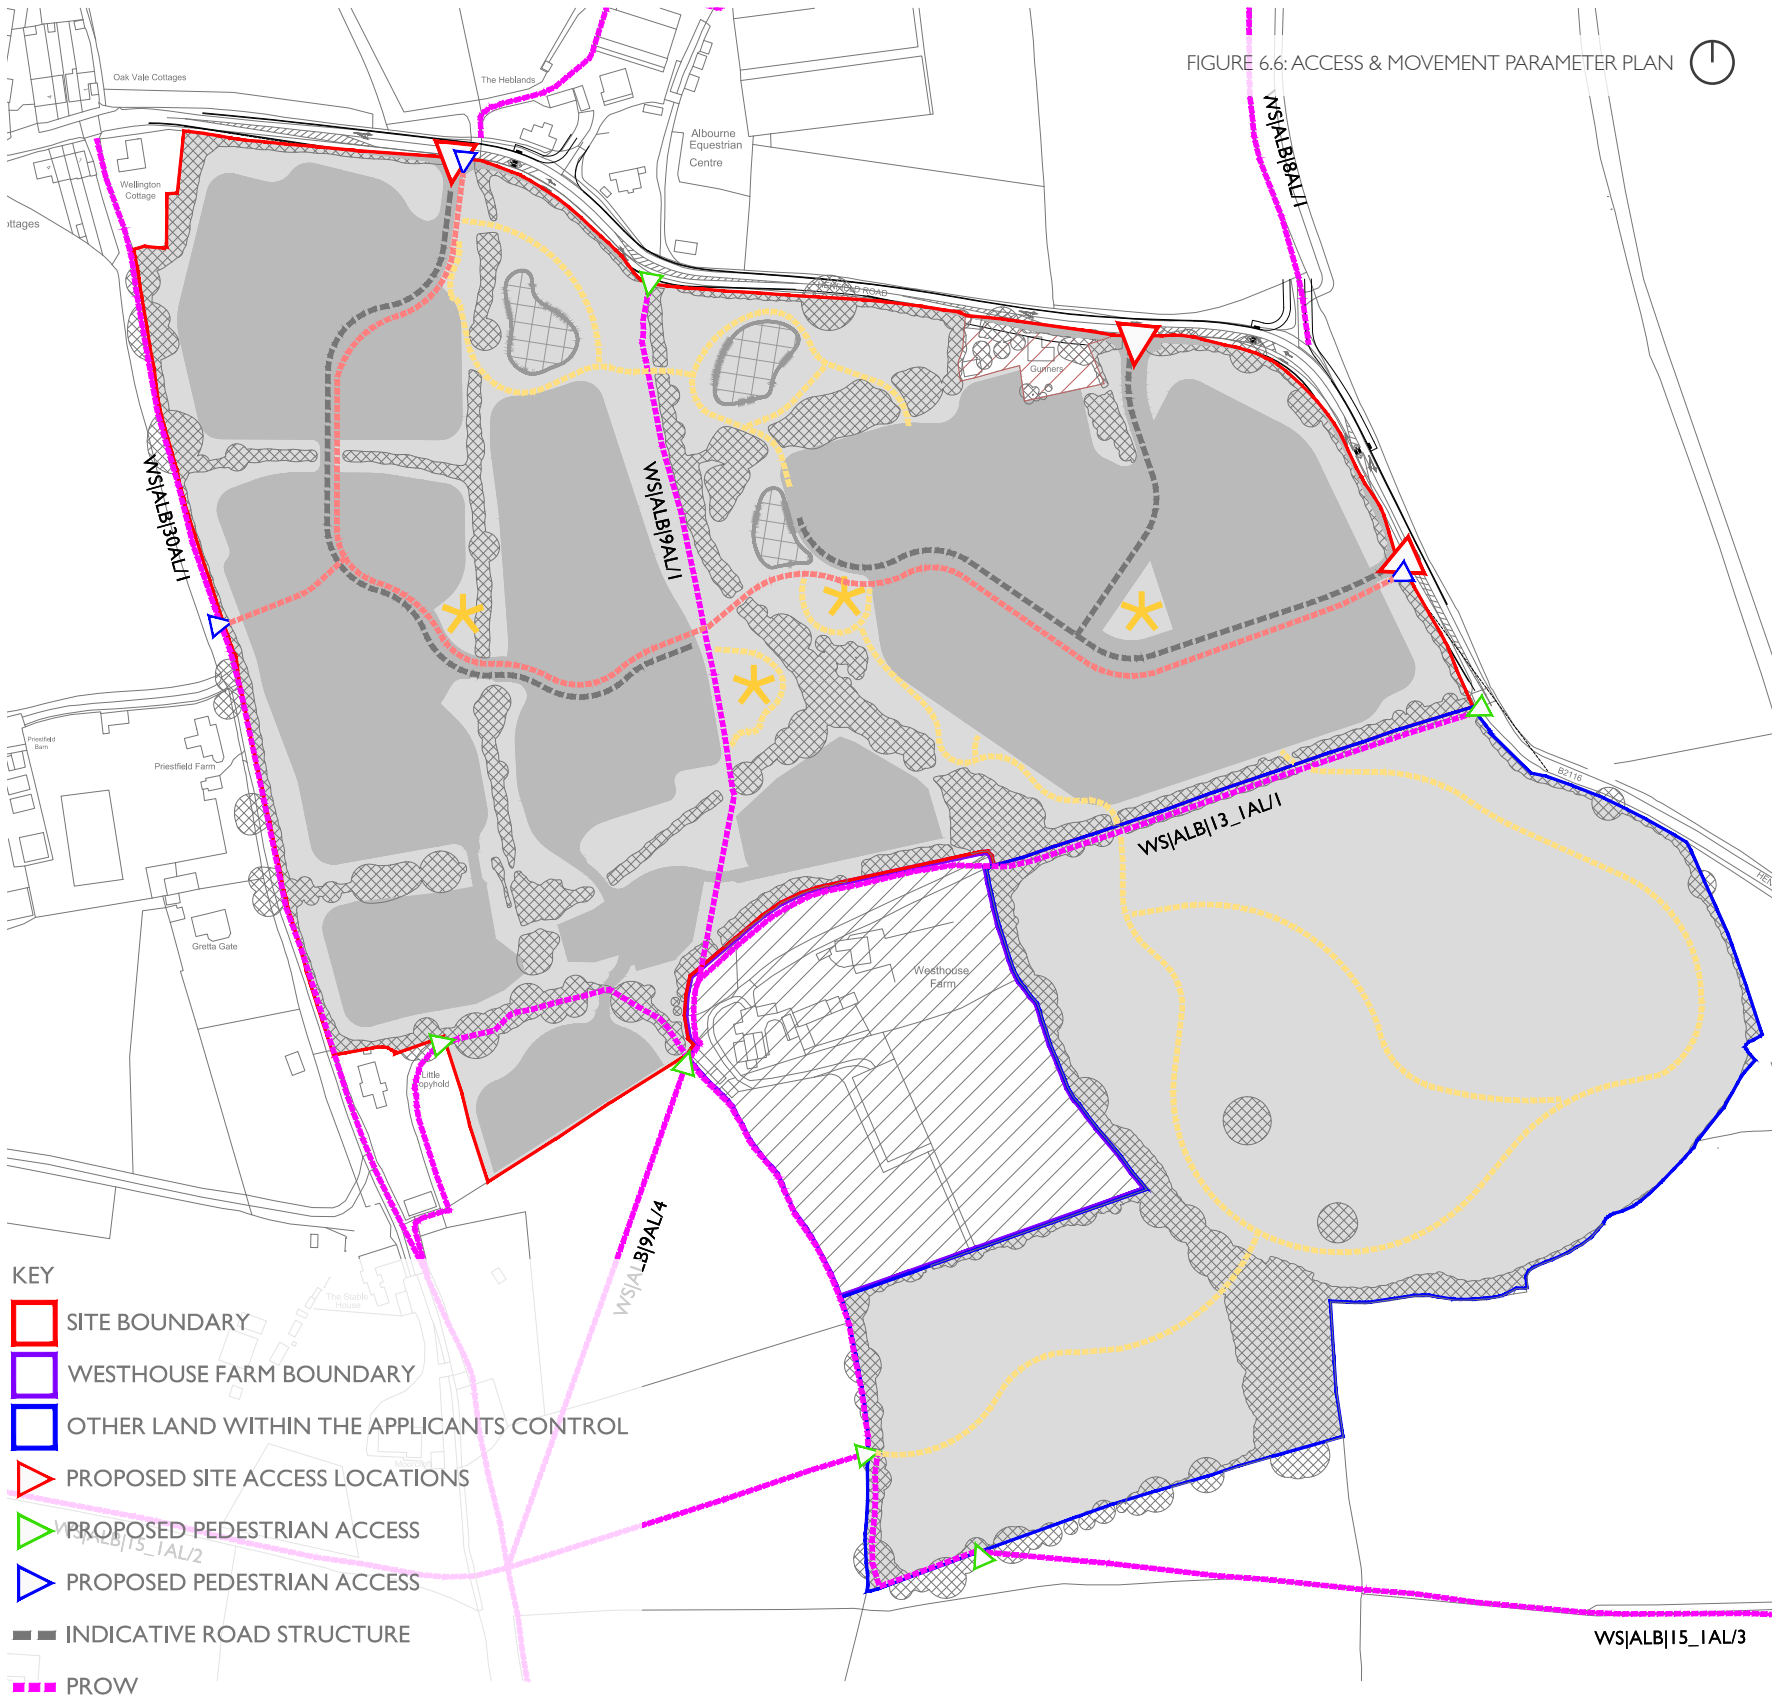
ACCESS & MOVEMENT PARAMETER PLAN
